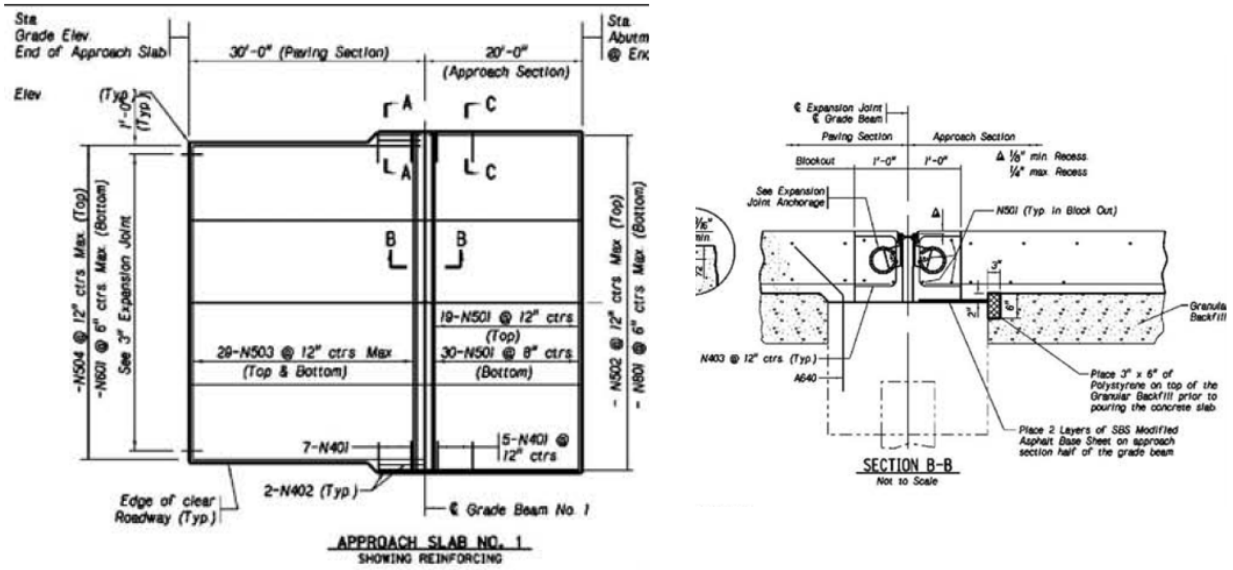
Details of the non-skewed approach slab (left), and the cross-section along with the grade beam (right) in Nebraska.
